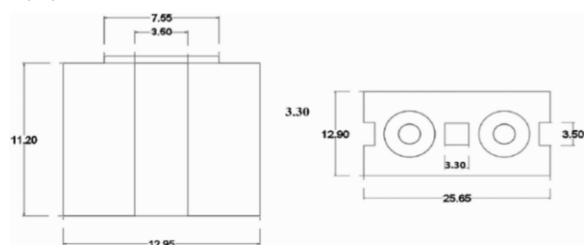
Typical Dimensions of the Interlocking Brick in cm (Side View and Top View)
